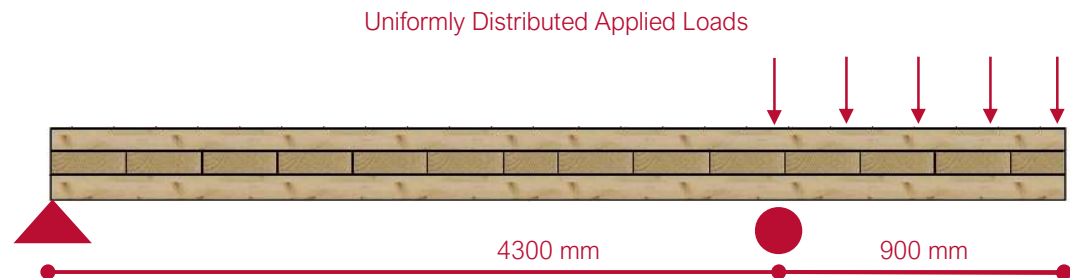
Cantilever Red Stag CLT Roof Panel Elevation
